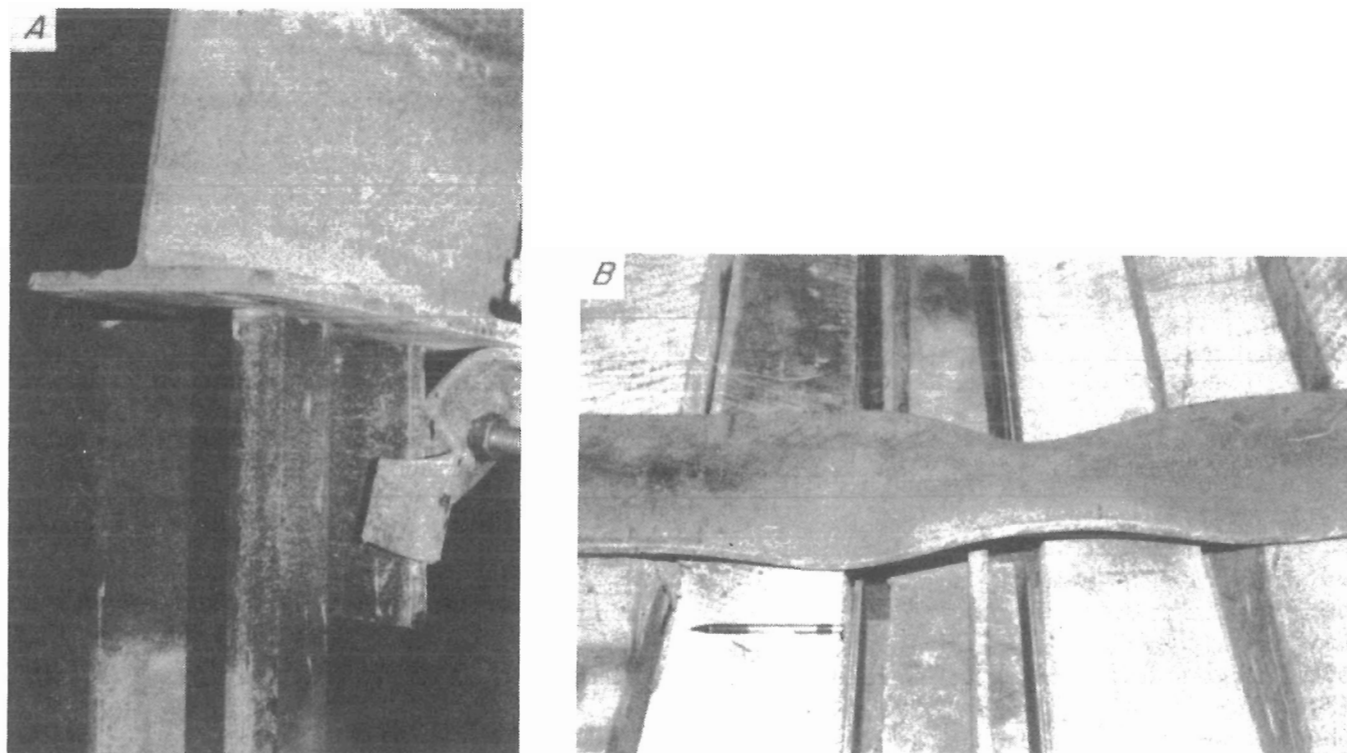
Crossbar. A, Rotation of ends; B, local buckling of flange.
